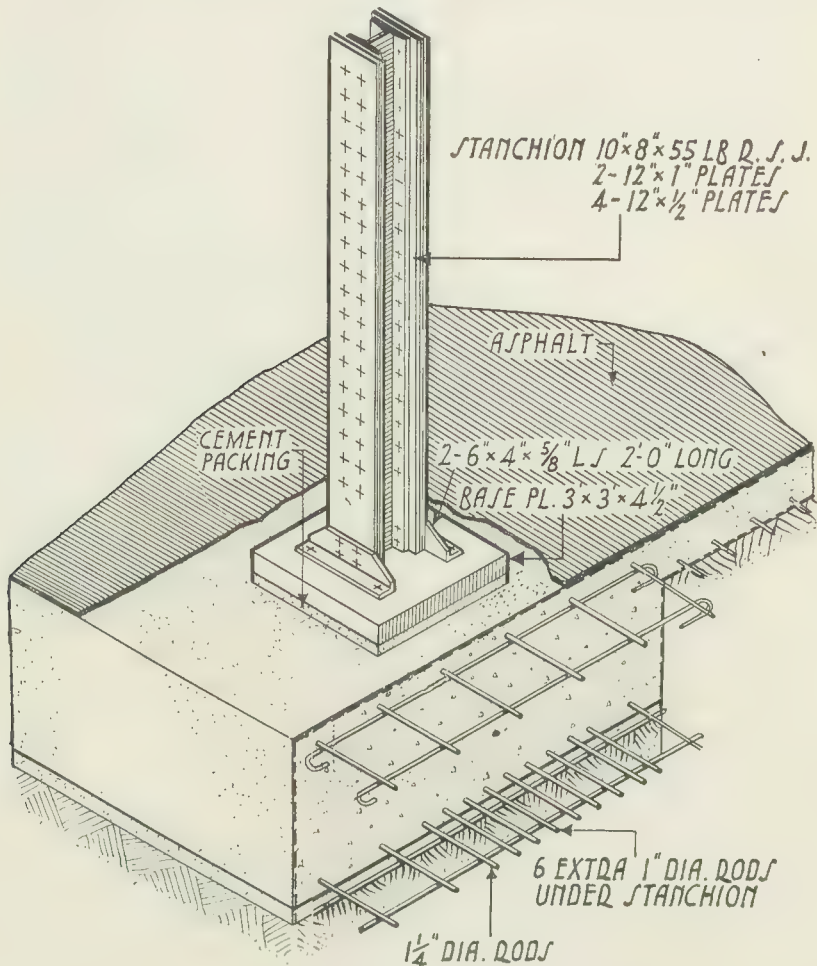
REINFORCED CONCRETE BEAM FOUNDATIONS FOR STEEL STANCHIONS
